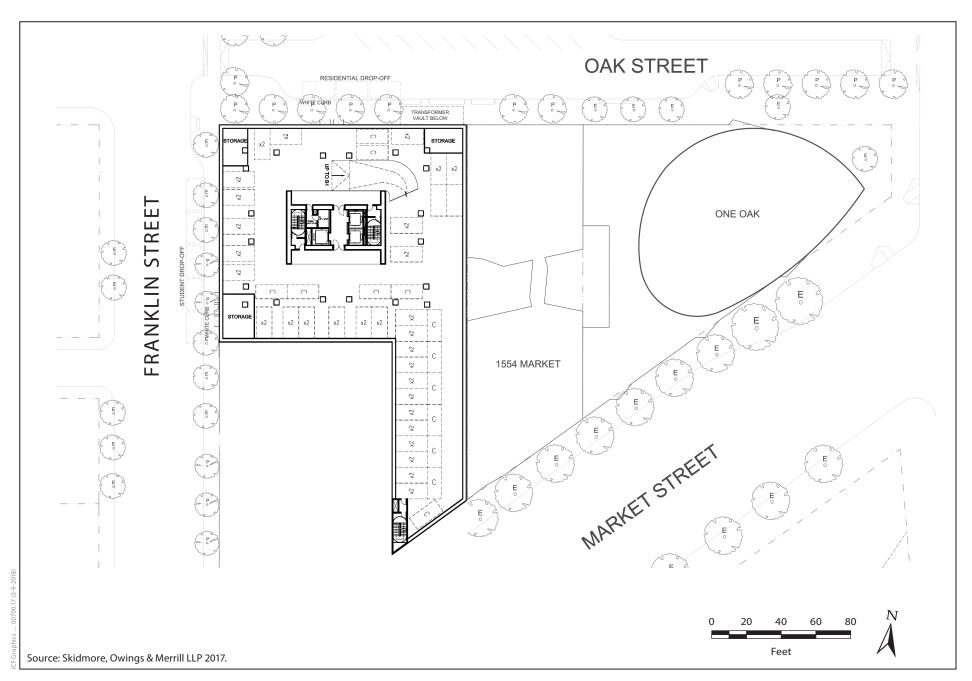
98 Franklin Street Project – Proposed Basement Level 2 Plan
